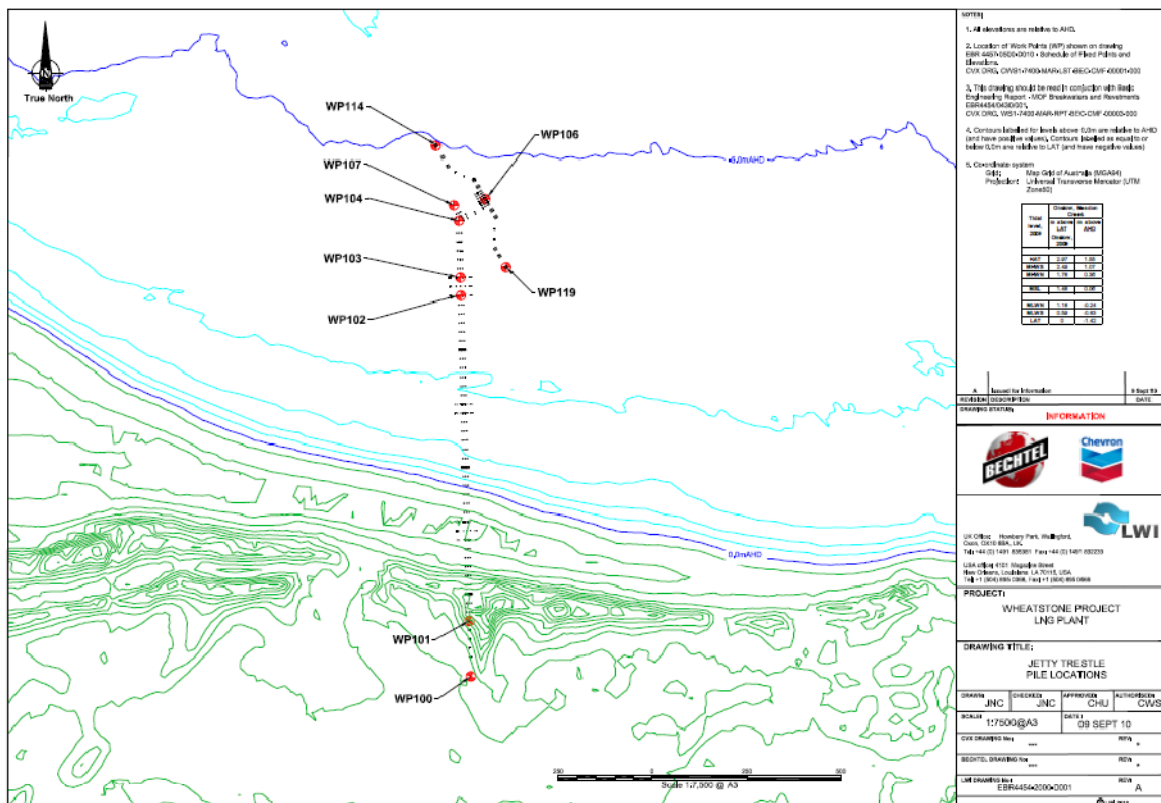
Locations of Work Points (WP) in the proposed Wheatstone port facility development.
